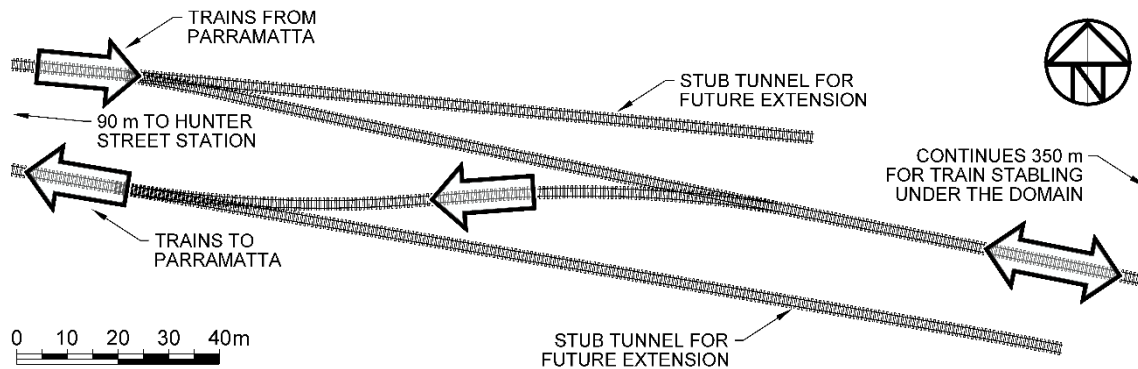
Schematic plan showing the functionality of the turnback tunnels, including stabling of trains and stub tunnels for future extension of the line.
